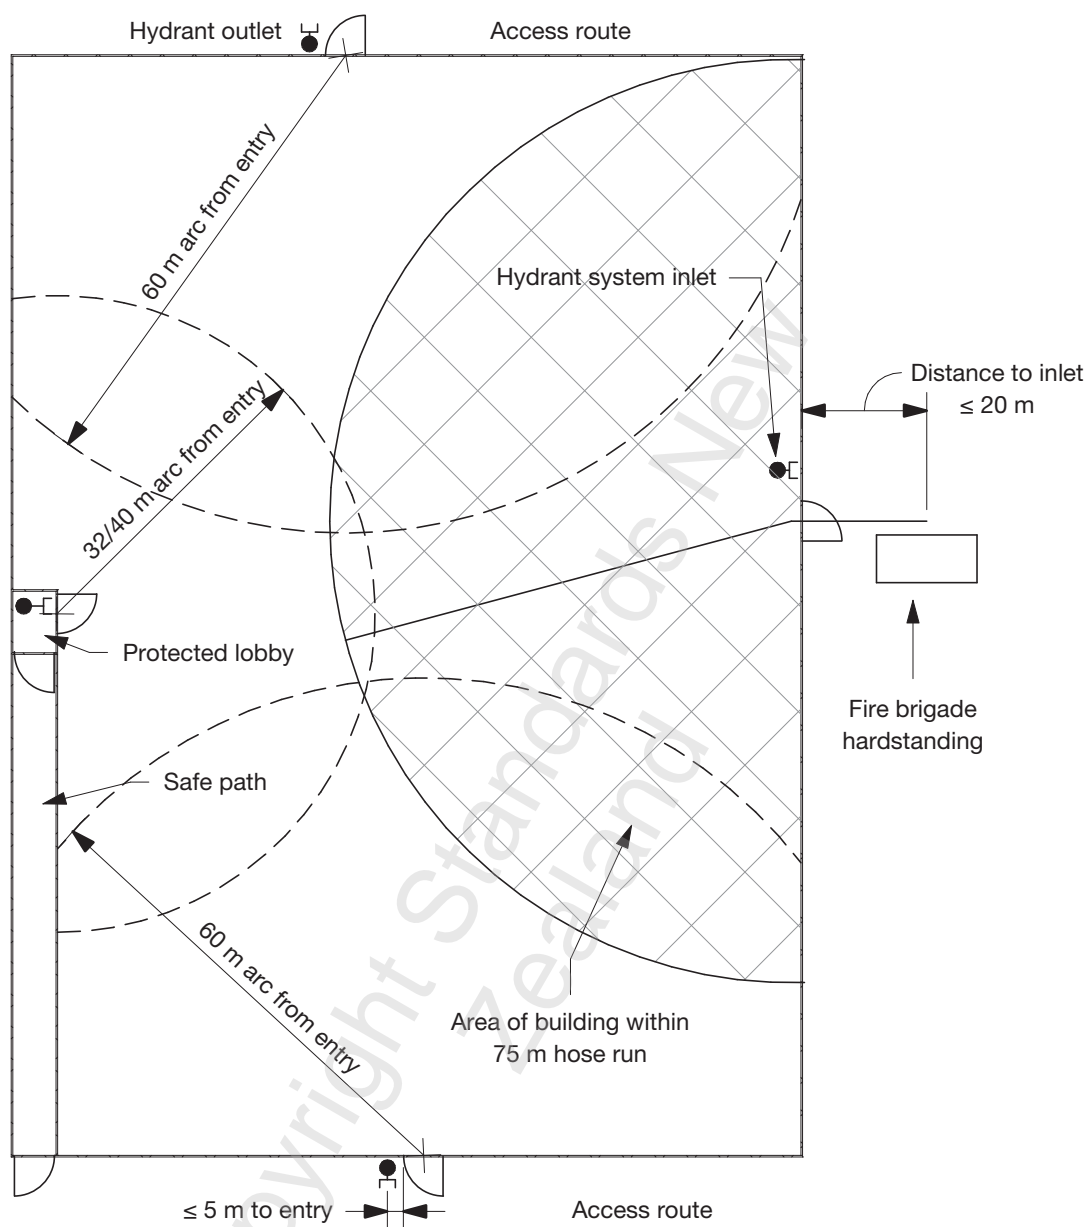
Low-rise building – Addition of external hydrant to provide hose run coverage
